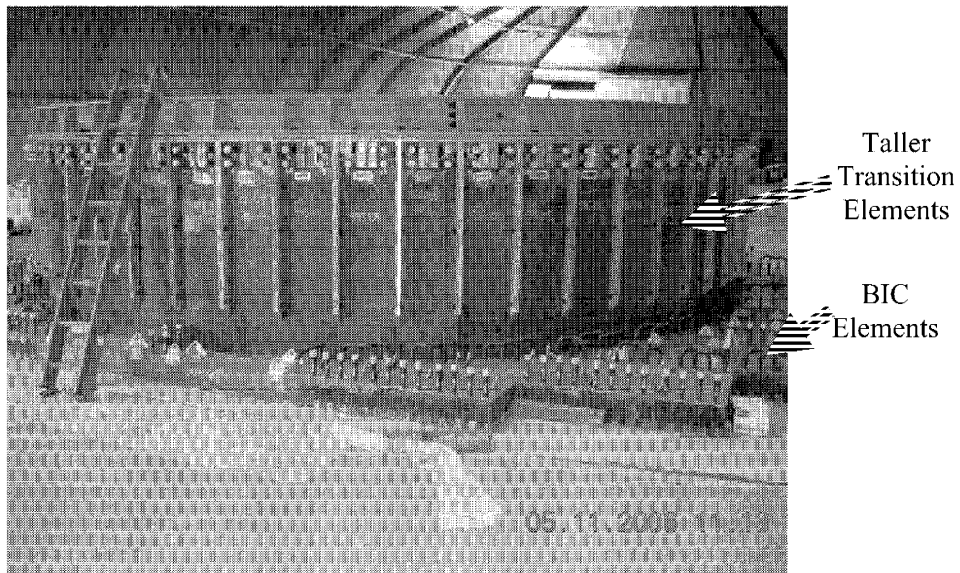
Pre-assembly of FSF Reaction Shaft Transition and BIC Roof Elements
